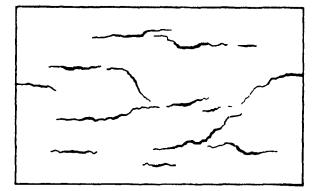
TYPICAL PLASTIC SHRINKAGE CRACKING\
